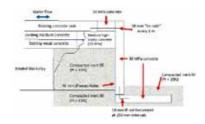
Cross-section of the concrete wall to prevent undercutting of concrete ford
